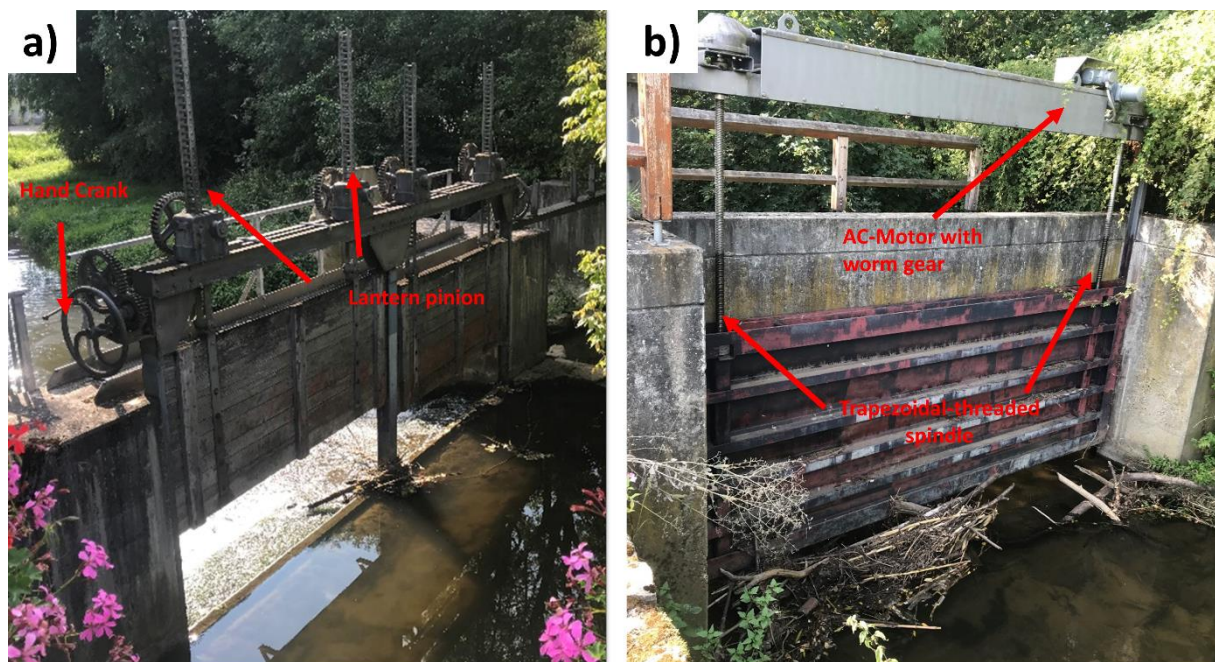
Standard sluice gate a) with hand crank and lantern pinion b) with AC-Motor and trapezoidal-threaded spindle
